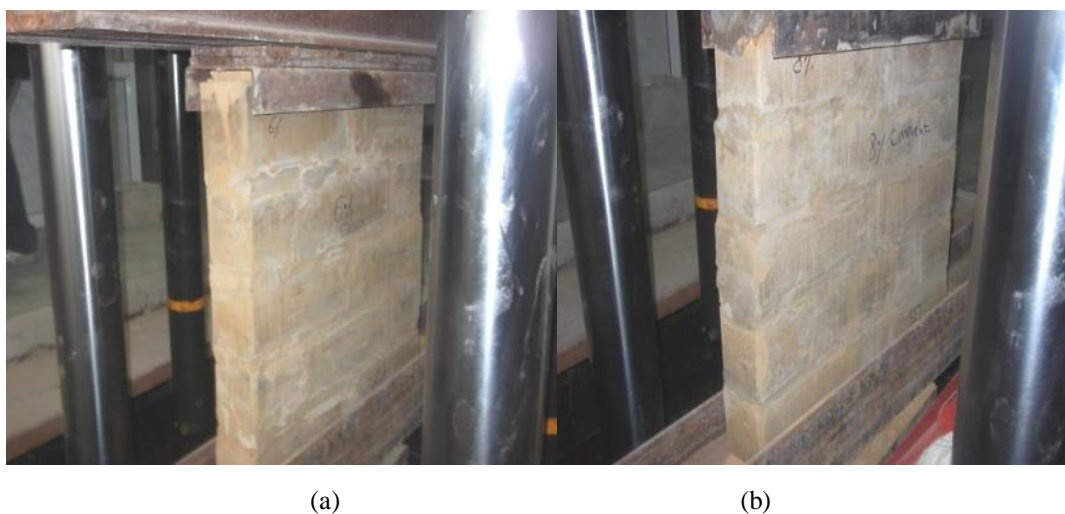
Compressive strength test on CSEB walls, (a) CSEB 6 % cement, (b) CSEB 8 % cement.
